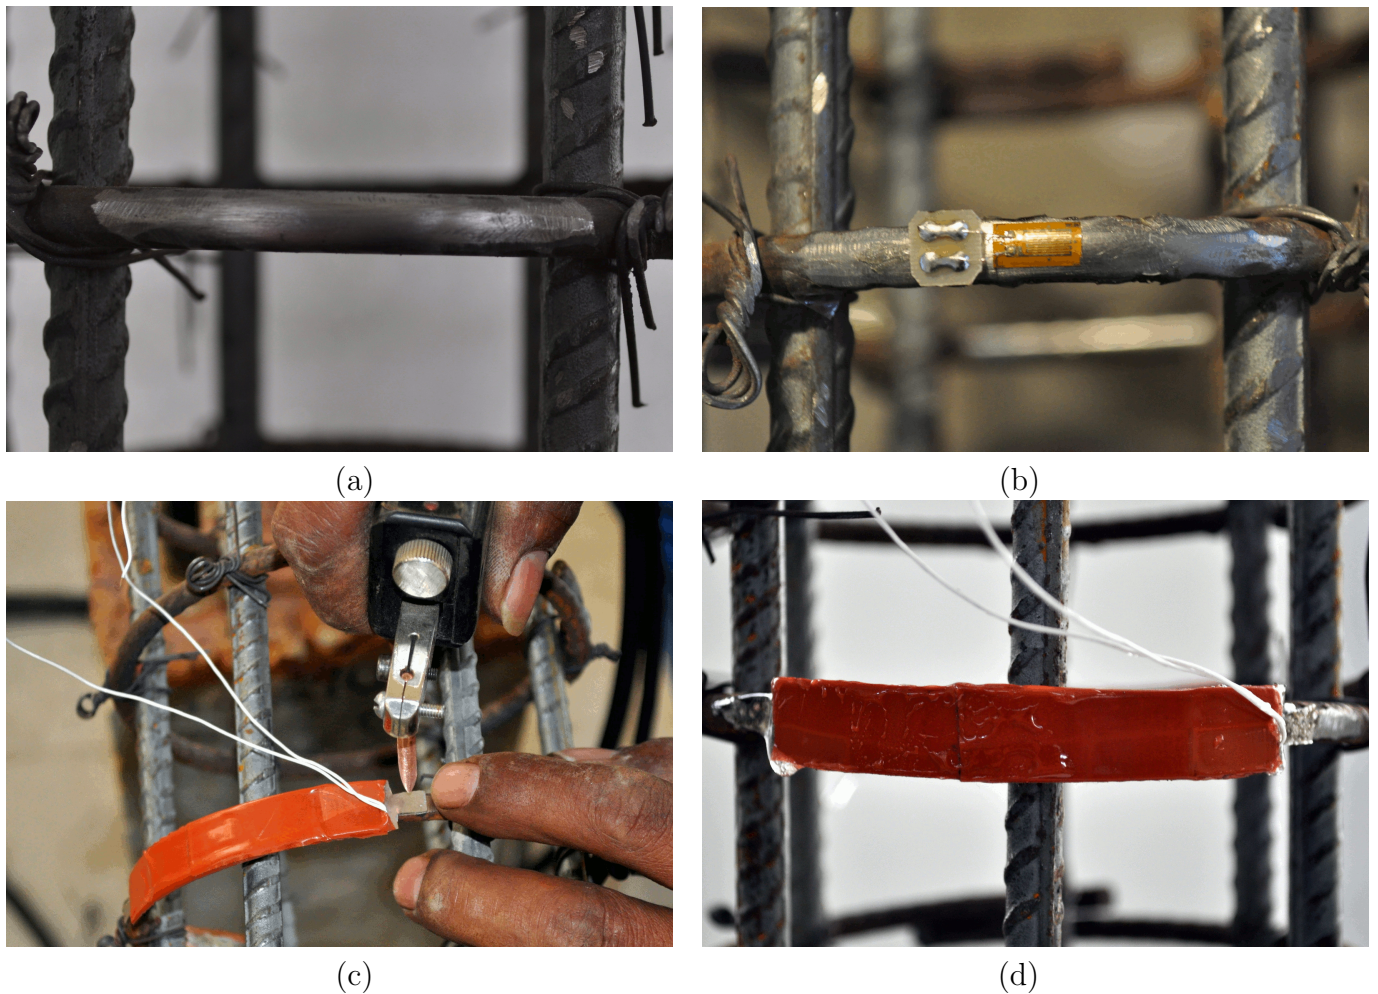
Strain gauges (a) Surface preparation (b) Bondable strain gauge (c) Spot welding (d) High-temperature resistant, weldable strain gauge
